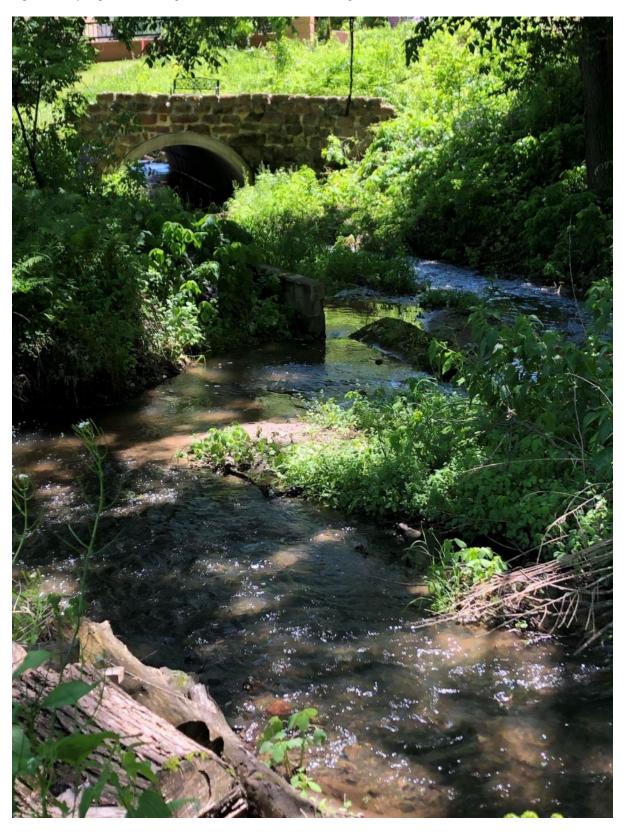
Spring Creek looking downstream at a failed retaining wall in the channel.
